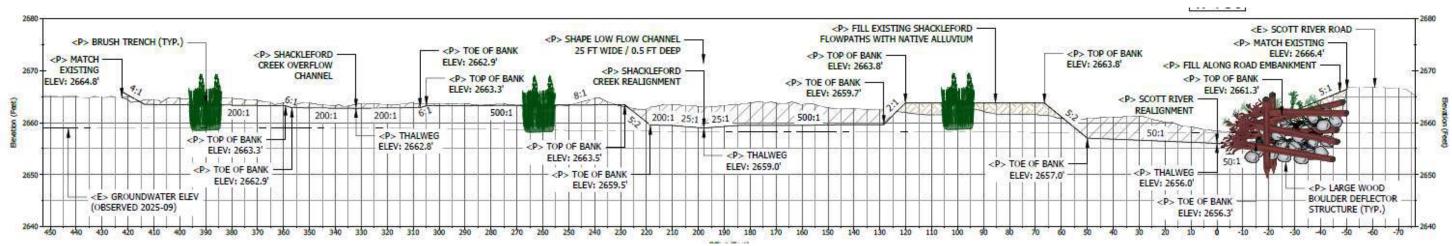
Example cross section view of proposed conditions from 60% design plans.
